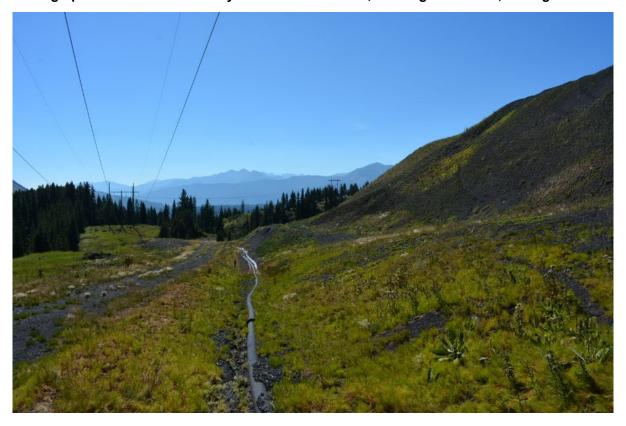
Site C CCR Facility – Downstream Slope, Looking Southwest, 30 August 2022
